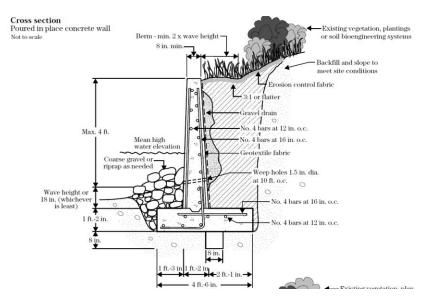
Cross section of a concrete retaining wall separating the embankment from mean high water with gravel or rip rap on the water side. USDA NRCS 1996.
